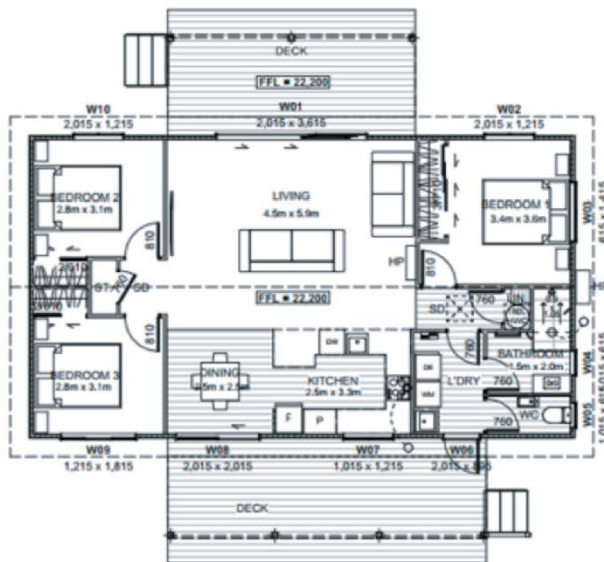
Ngāi Tūpōtōki Motukaraka - Waikiwi Papakāinga - Floor plans
